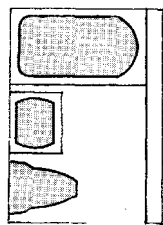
A wall of shelves is added by overhanging the tub or going to a 4 1/2-foot tub.
